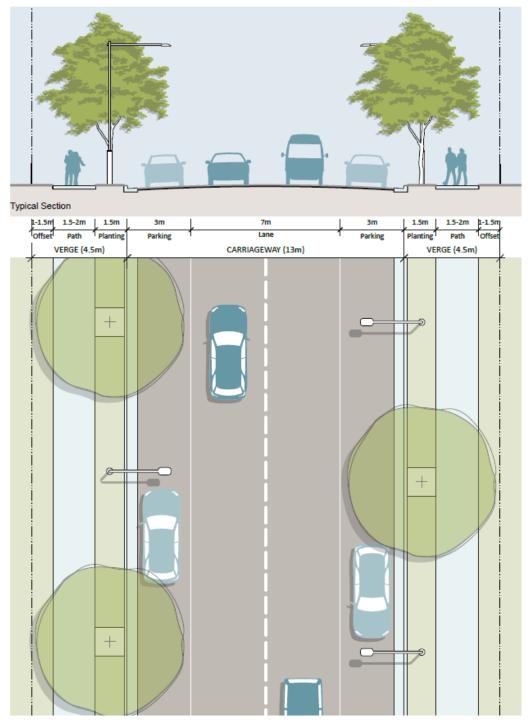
Typical Plan and Section – Collector Road – Tier 2
